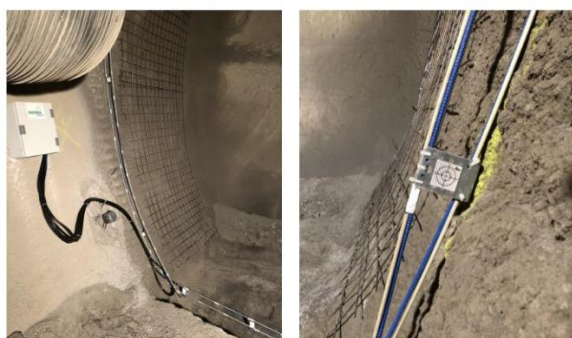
Installation of Extra and Intra sensors in a shotcrete section.
